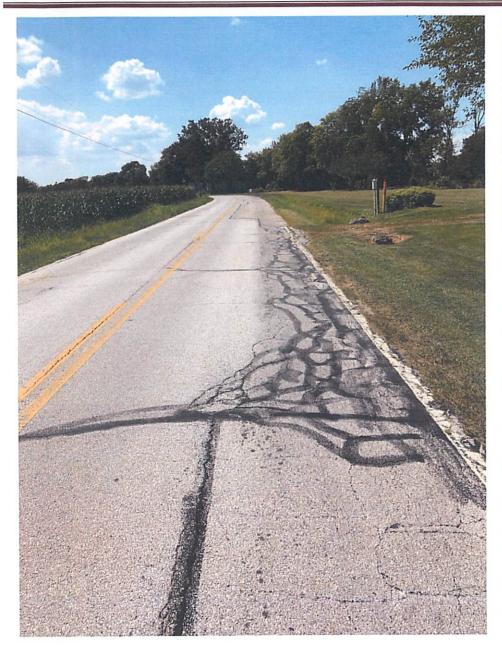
& 2 – Extensive Raveling, Block Cracking, Patching, Etc.
